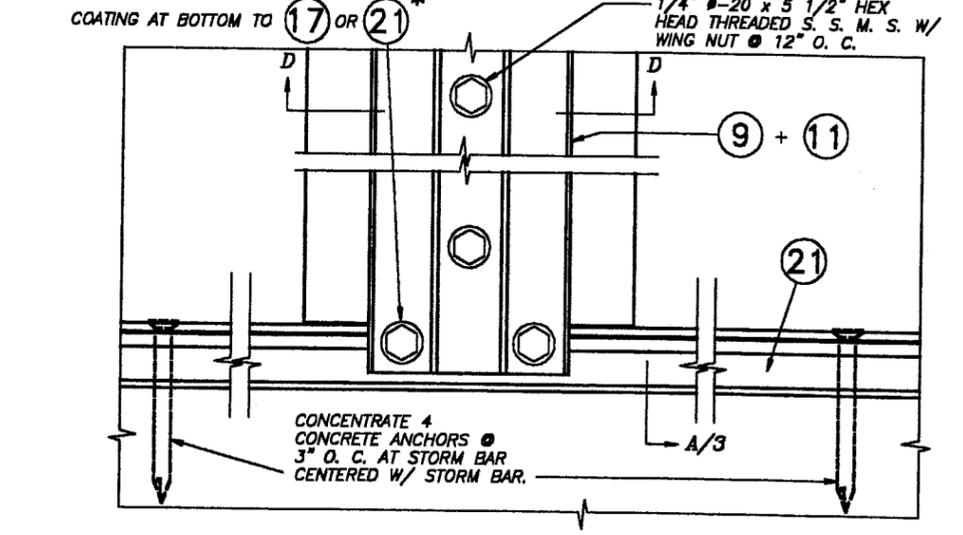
(ELEVATION) : TOP (SIMILAR FOR DETAIL 2 BOTTOM)
